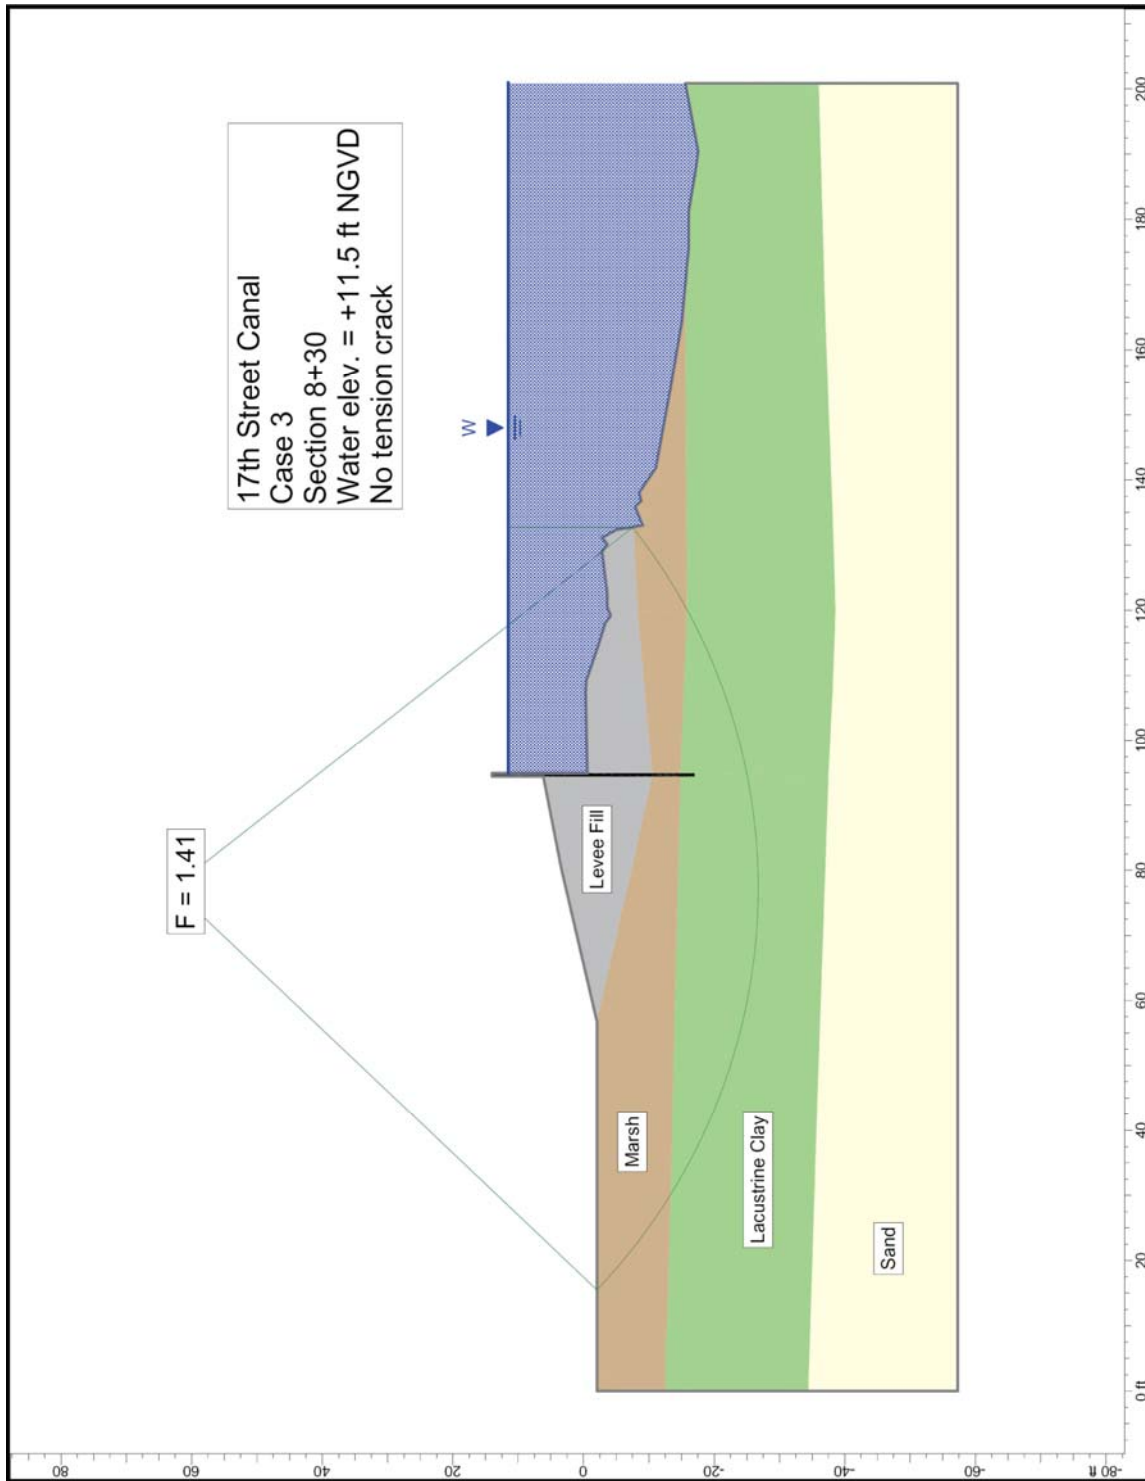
Critical circle for 17th Street Canal Station 8+30 – water elevation 11.5 ft, no tension crack.
